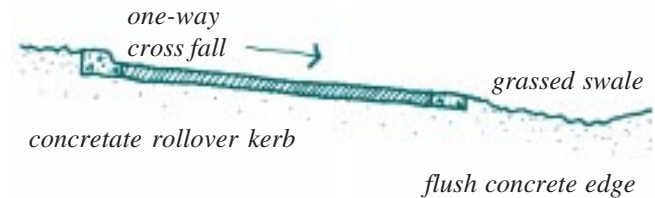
Alternative pavement edges can contribute to an attractive streetscape and assist drainage.
